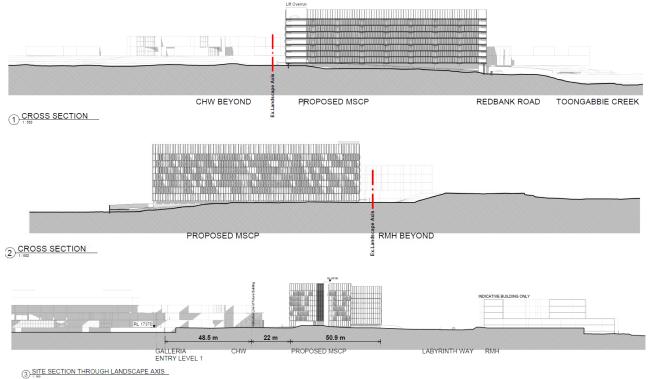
Site Sections and Elevations for the proposed development Source: Billard Leece Partnership Architects (2020)
